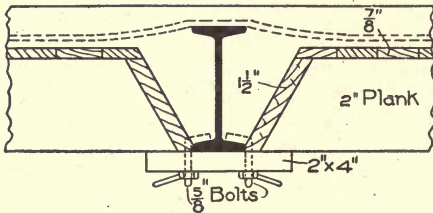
Form for Reinforced Concrete Slab between I-beams.
